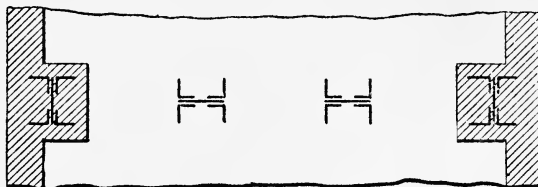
CROSS-SECTION OF COLUMNS IN TRANSVERSE BENT
